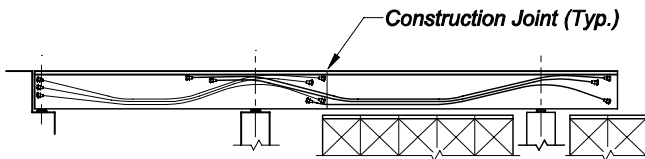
Tendon Layout for 4-Span Bridge, CIP on Falsework
